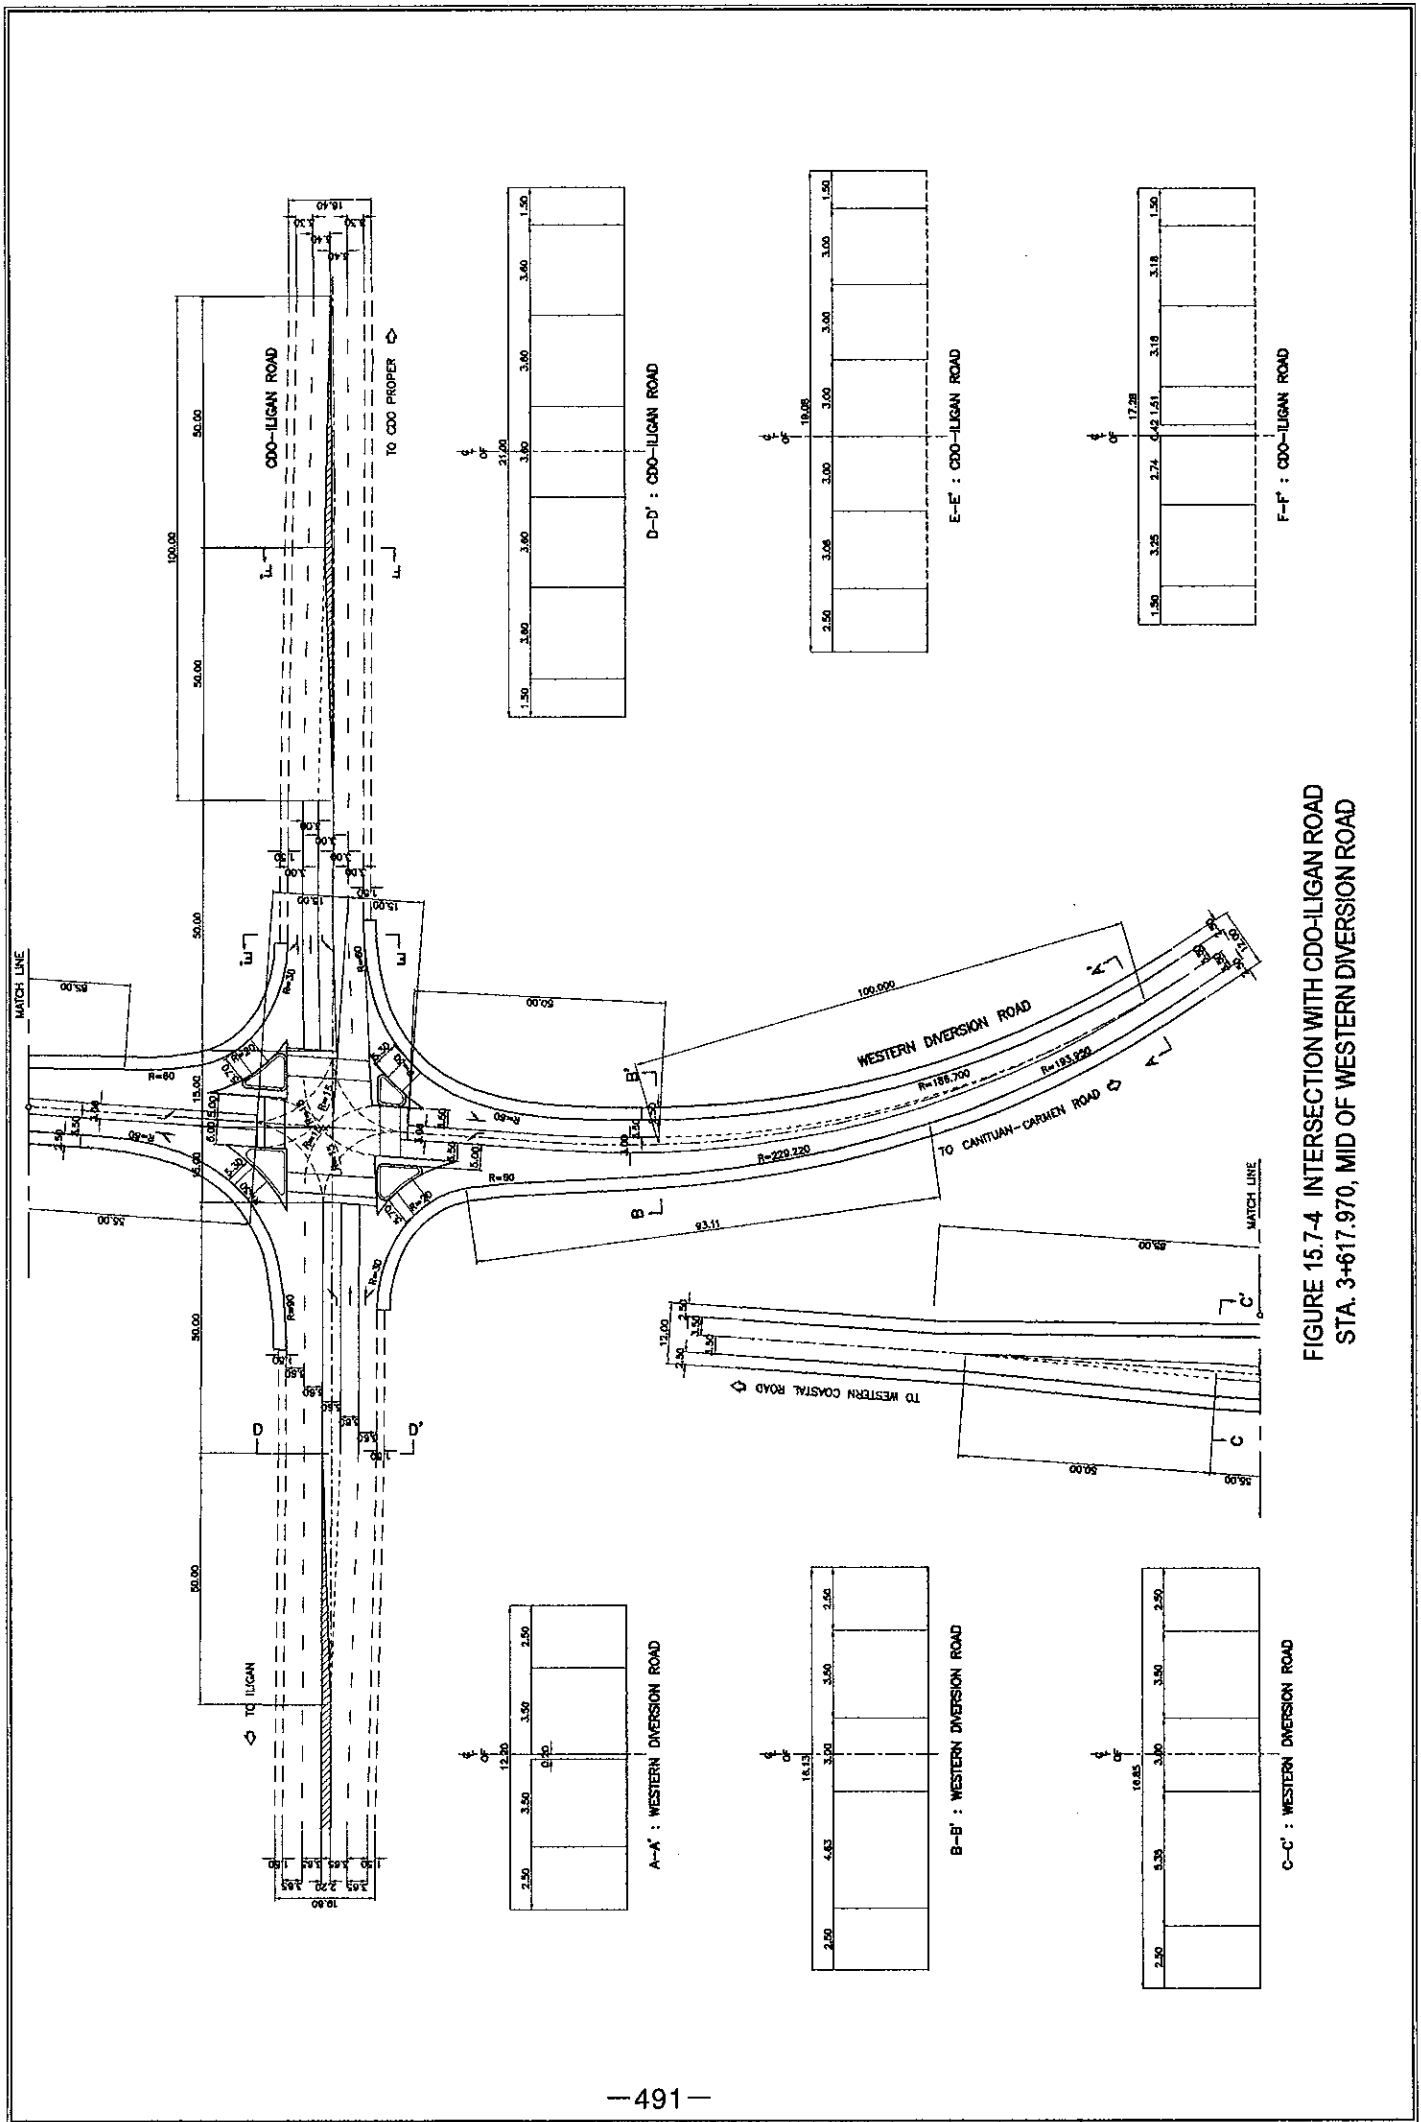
INTERSECTION WITH CDO-ILIGAN ROAD
